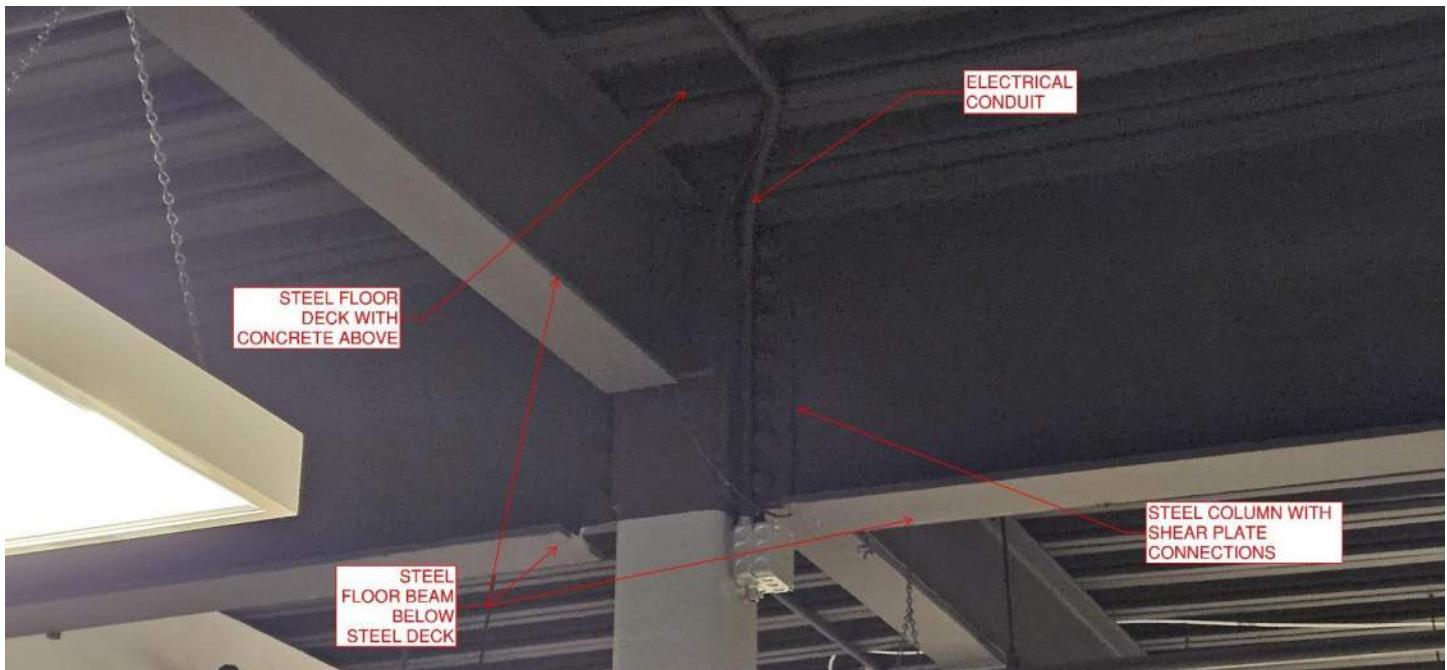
UPPER FLOOR FRAMING OF BEAMS TO COLUMN
